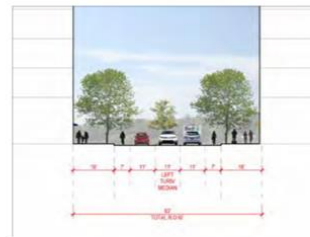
Cross section showing improvements to South Pickett Street - "A" street
